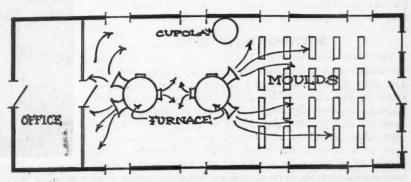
Plan of a Foundry Heated with Warm Air Furnace Units.
